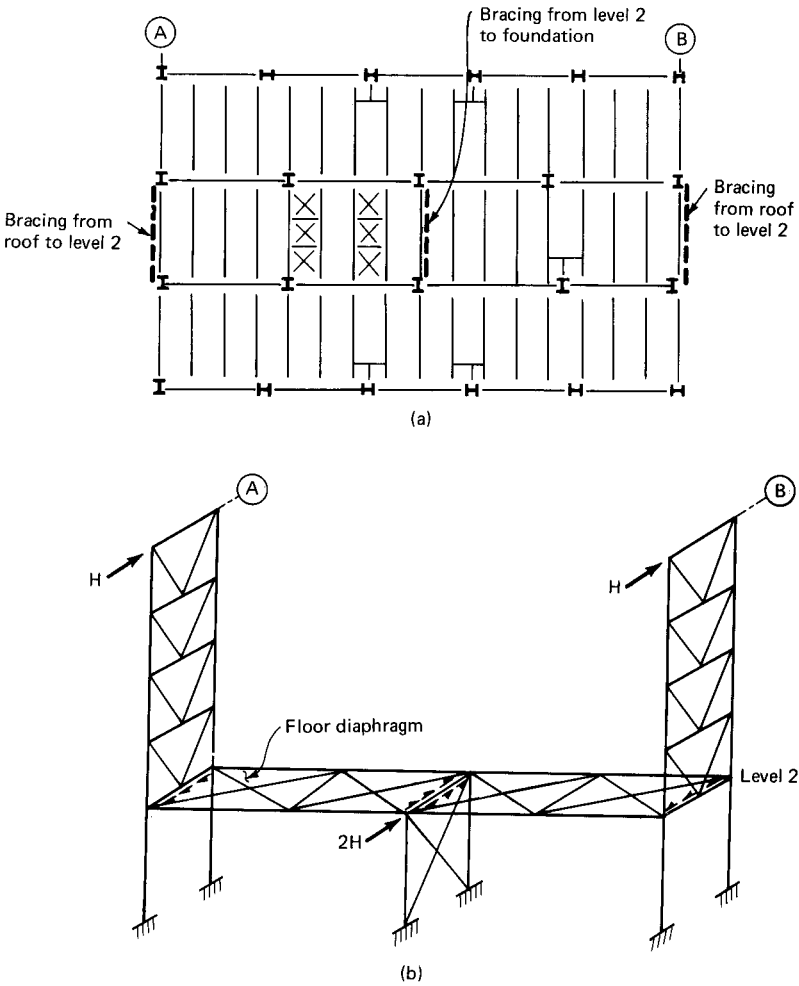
Conceptual model for staggered truss system. (a) Building plan; (b) lateral load transfer through diaphragm action.
